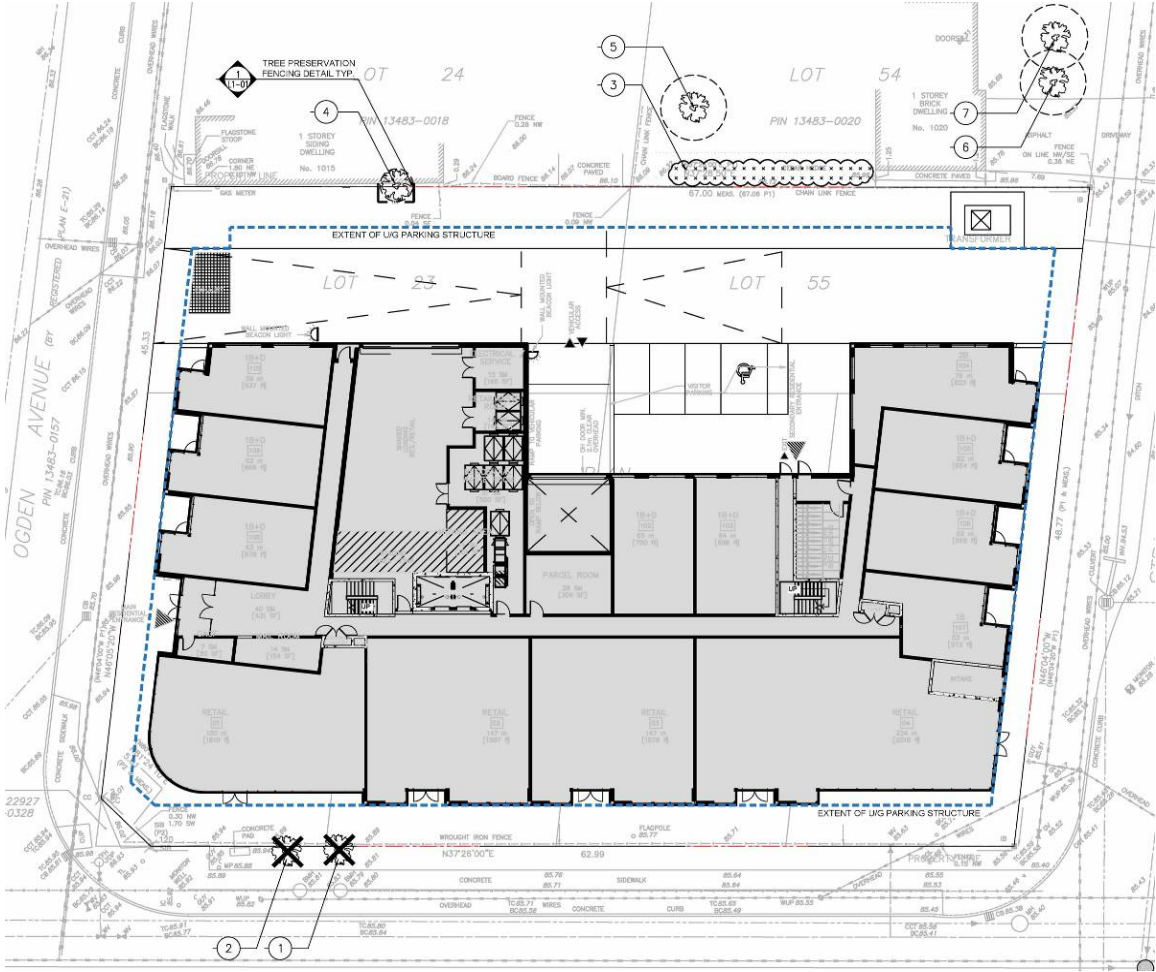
Tree locations on the 1041 Lakeshore Road East development site
